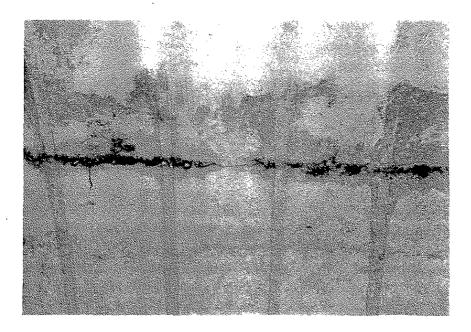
Cold Joint Crack on East Side of Culvert
